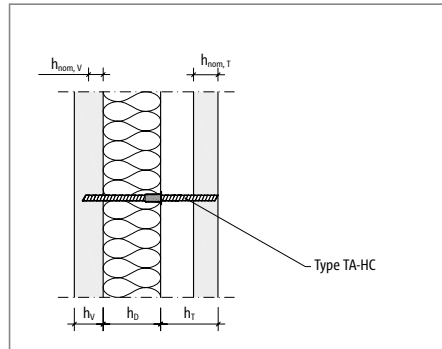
Schöck Isolink® type TA-HC: Cross-section details for the element wall  $h_{nom,V} < h_V$
